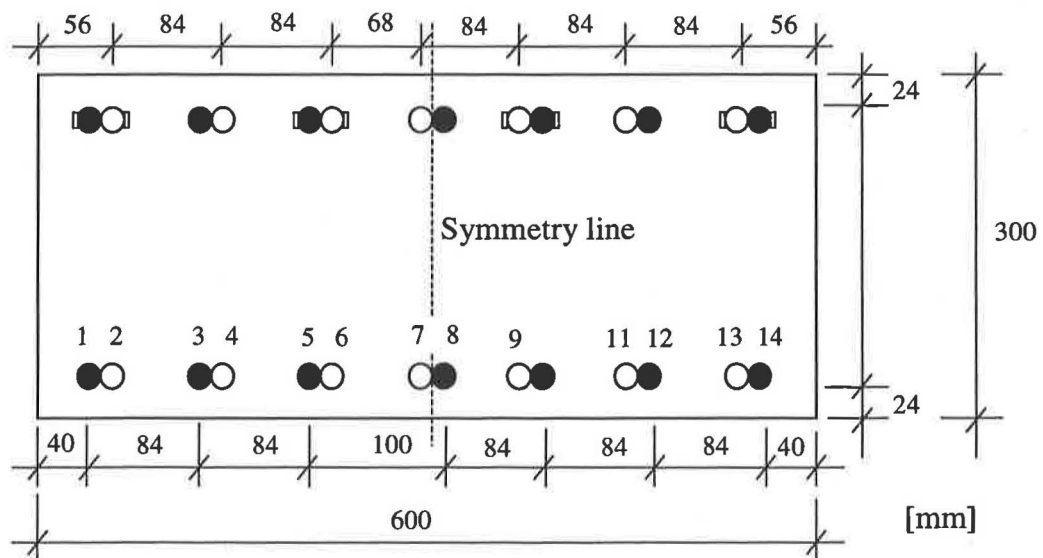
Reinforcement detailing of specimen RV13 (transverse section A-A).
